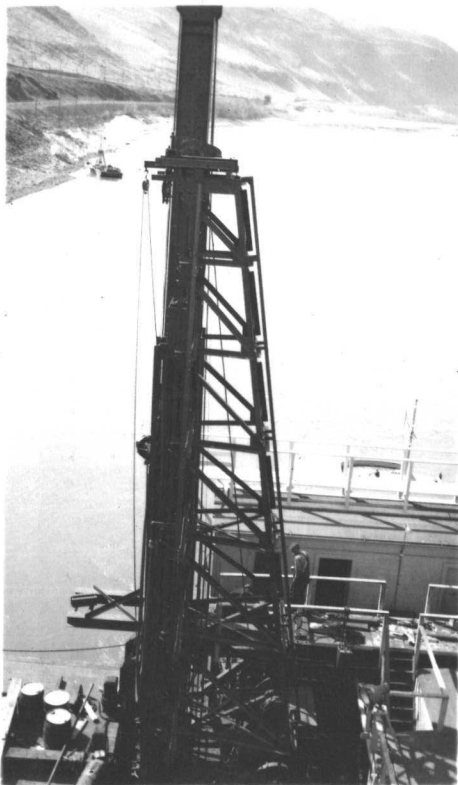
A drill tower and anchor spud on the Siems-Helmers, Inc. drill boat. An anchor barge in the distance
